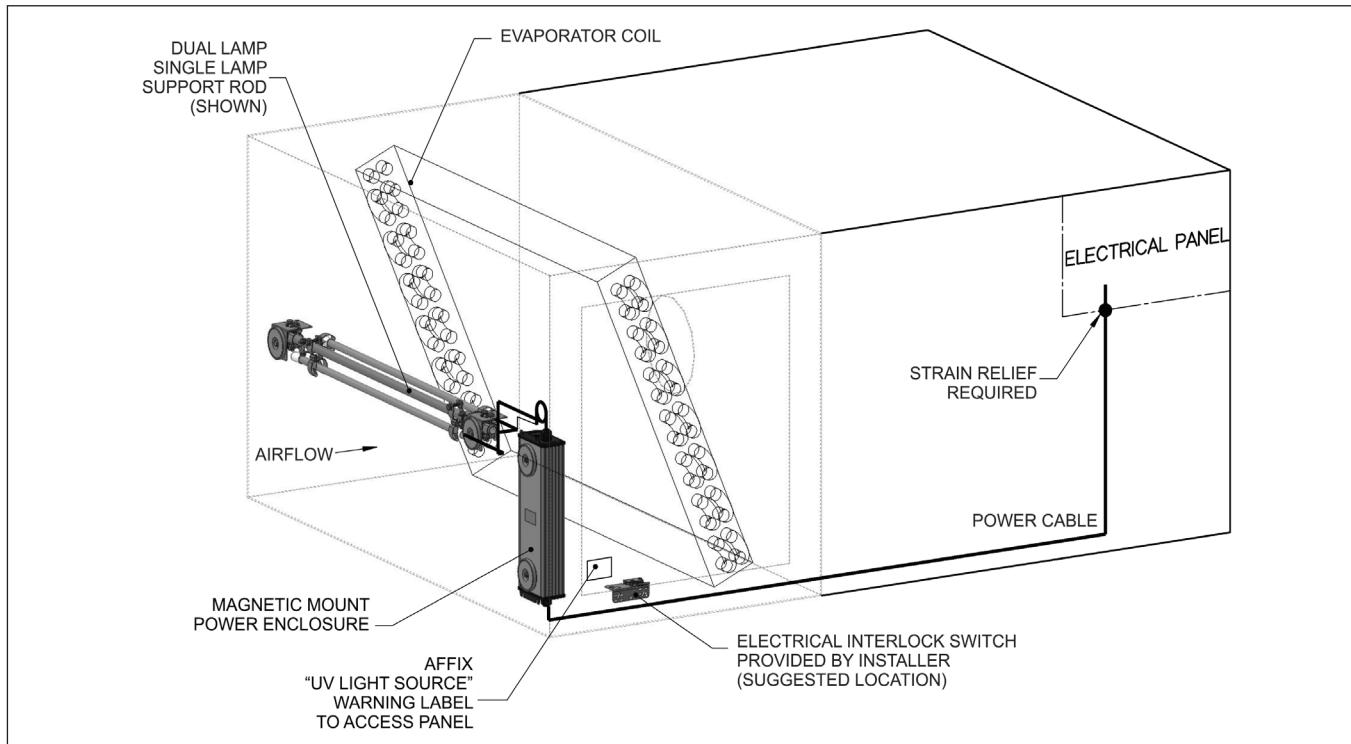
Generic Example of Rooftop HVAC Return Air Side Installation
